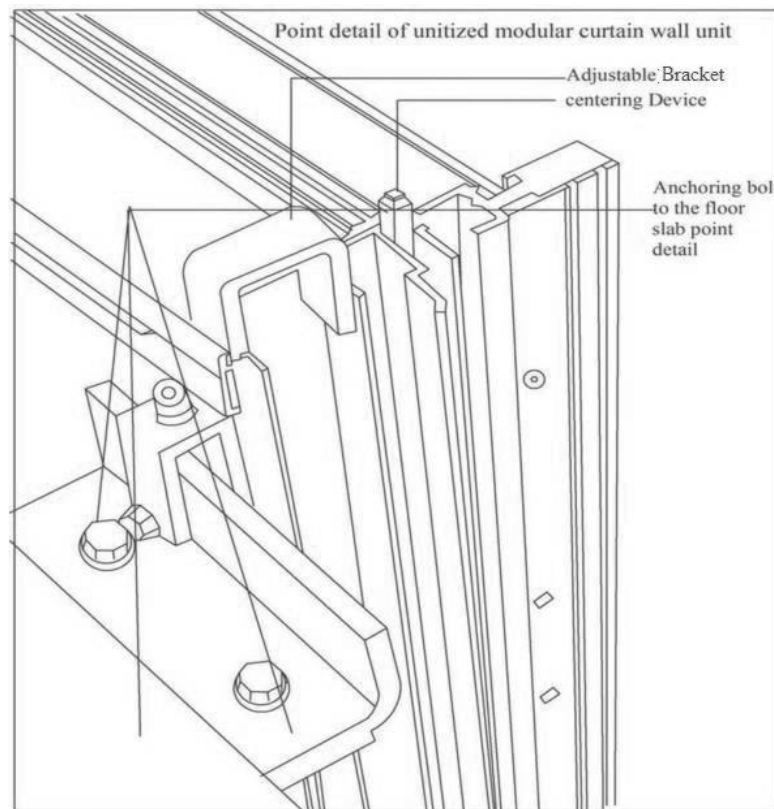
A Typical Point Detail for Anchoring a Modular Unitized Curtain Wall to Floor Slab for Al-Jawhara Tower in Kuwait (Drawn by Author).
